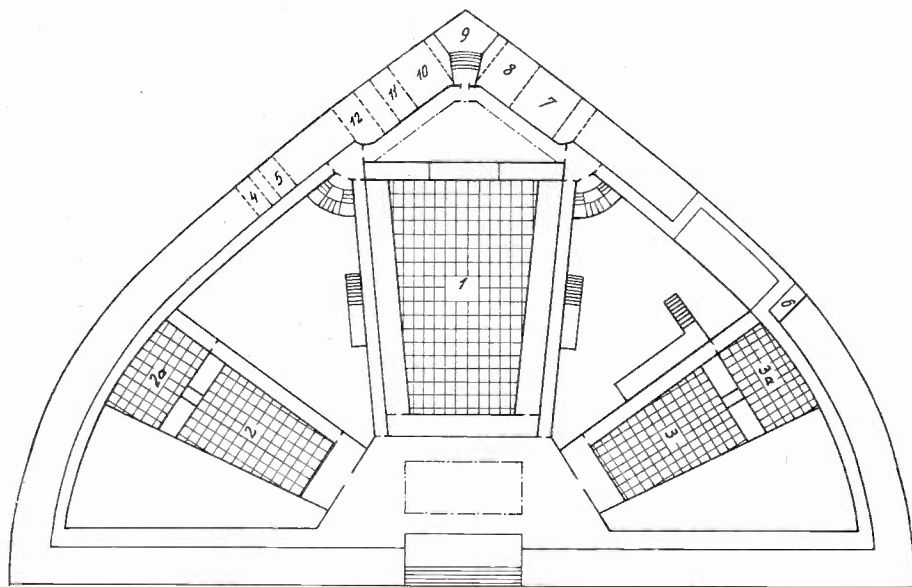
Ground plan of the ground floor; the rooms marked by dotted lines are situated on the first floor.
